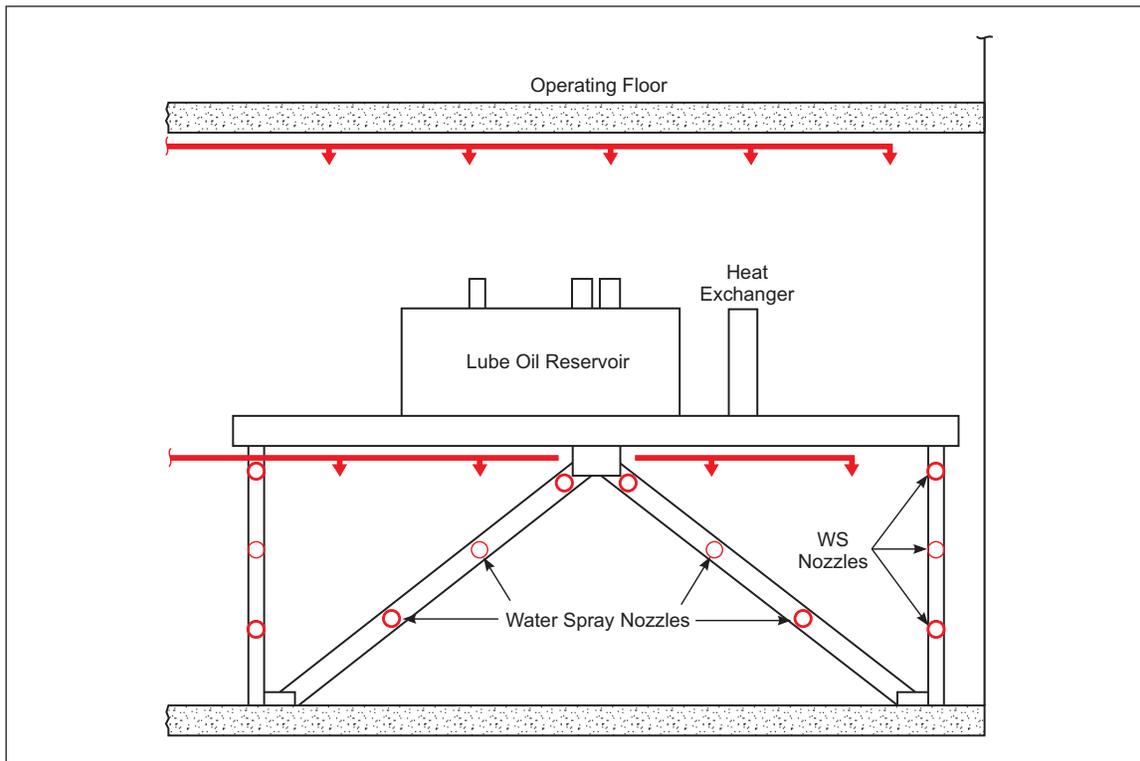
Elevated lube oil reservoir shows protection of exposed steel.
